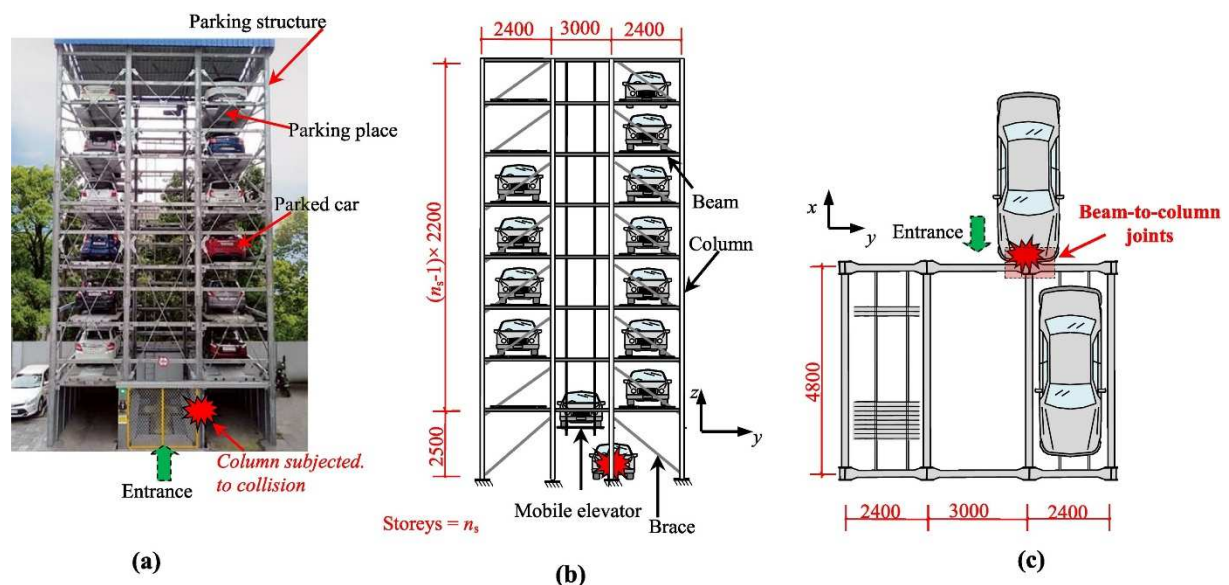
Configuration of the parking structure: (a) real picture; (b) structural arrangement in elevation view; (c) structural arrangement in top view at the second floor (in mm).
